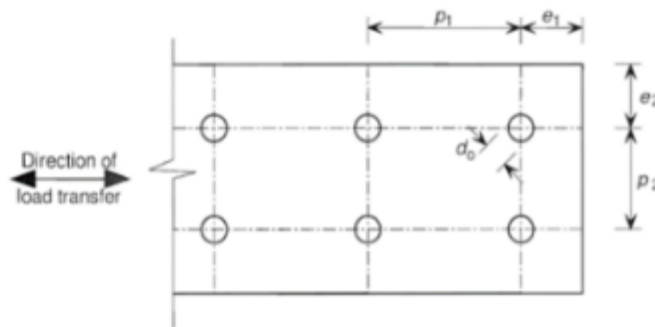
End distance, edge distance and spacings for fasteners and spot weld
